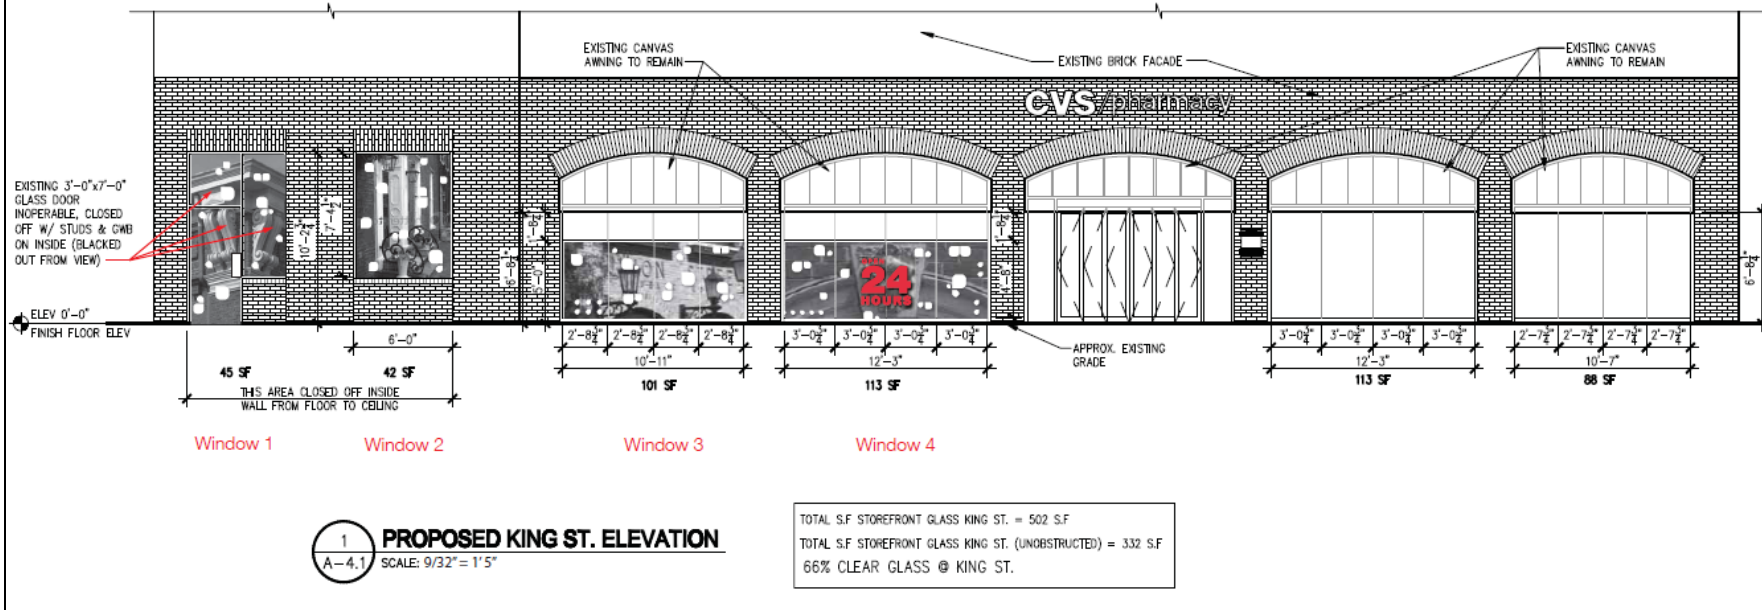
Proposed south (front) elevation (wall sign is not accurate) showing window alterations on King Street.
